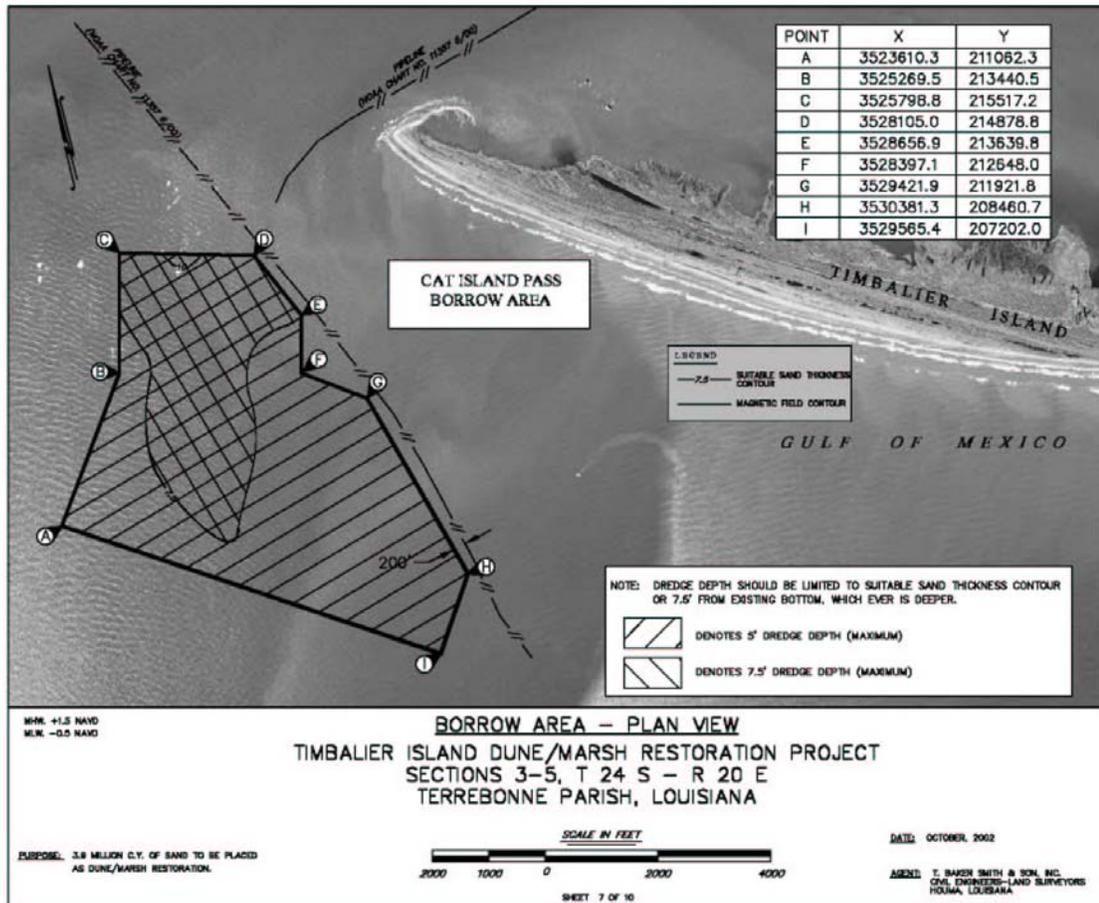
Cat Island Pass Borrow Area – Plan View
